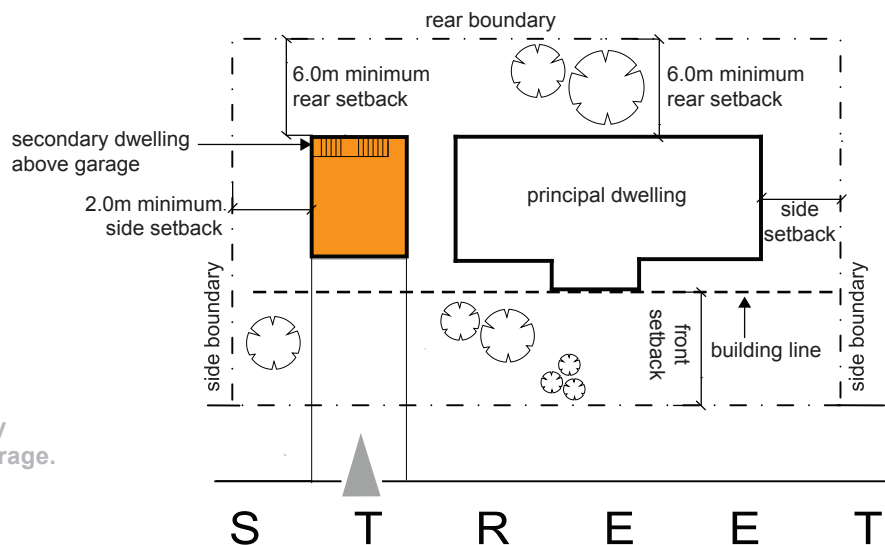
A.3-4: Setback controls for secondary dwellings above a detached garage accessible from a secondary street.
